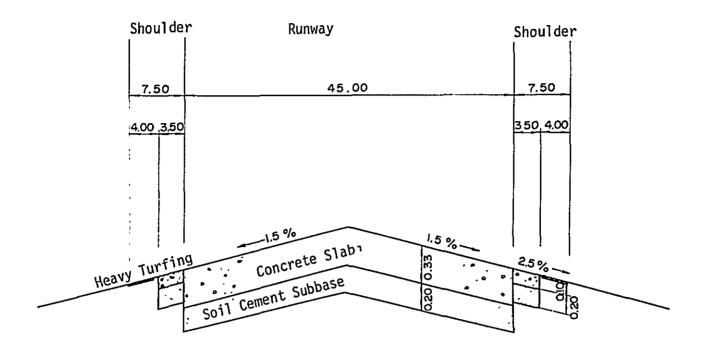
Standard Cross Section of Rigid Pavement - Runway
